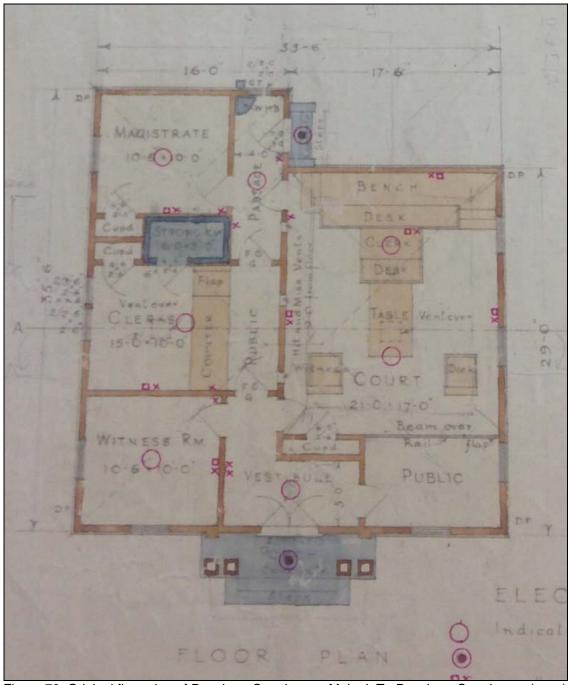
Original floor plan of Papakura Courthouse. Mair, J. T., Papakura Courthouse (copy), Public Works Department Collection PWD 76289 AA 1044, DW13, Architecture Archive, University of Auckland Libraries.
